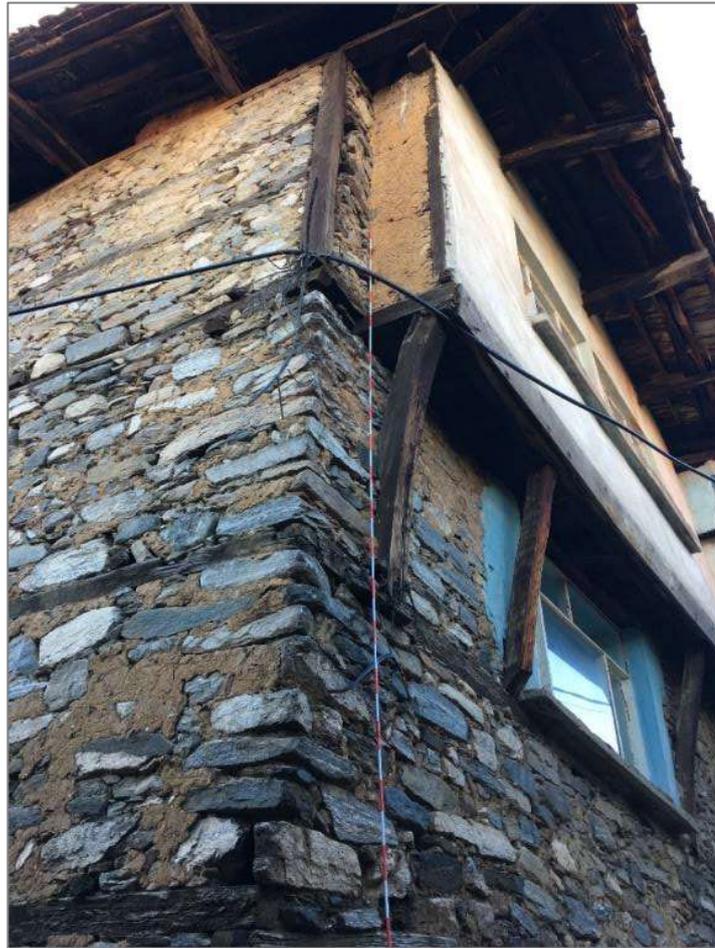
Corner connection of rubble stone masonry wall – 2800-1
